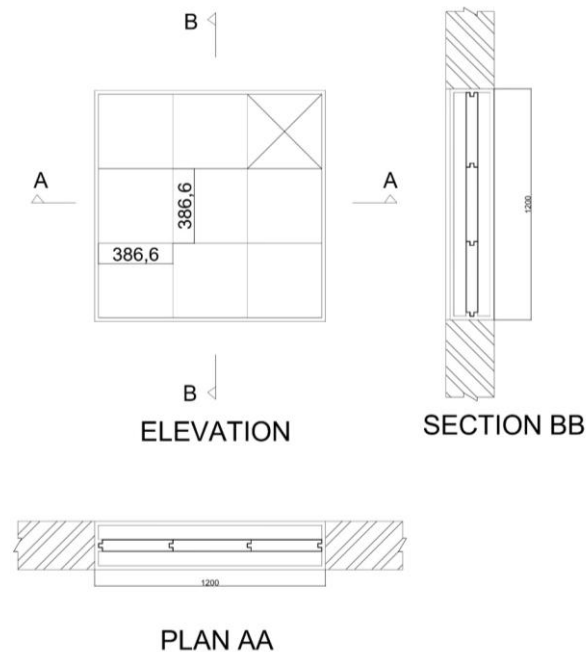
Technical drawings of PuzzleGlaze prototype, a nine- panel window
